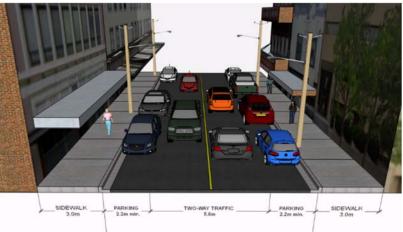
Gottingen Street Typical Cross Section Looking South Buddy Daye Street to Falkland Street
